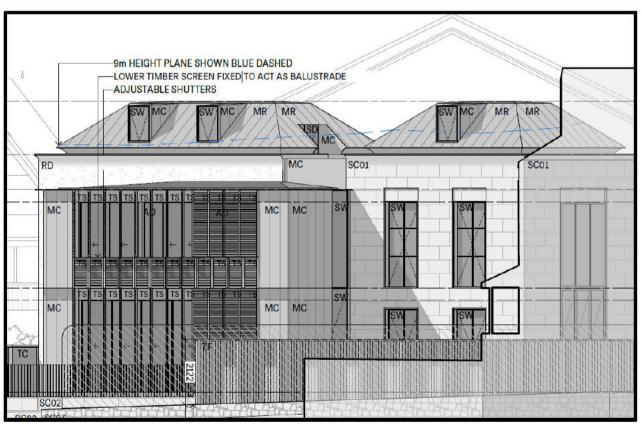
West Elevation (Source: Andrew Burns Architecture)
